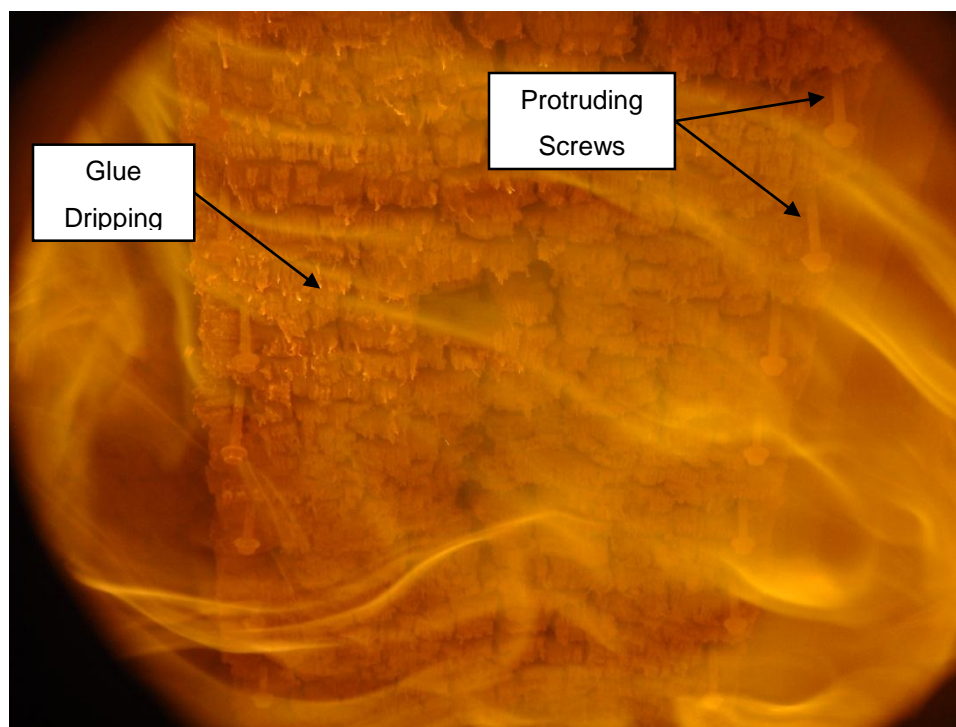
shows the same floor section at 75 minutes into furnace testing.
